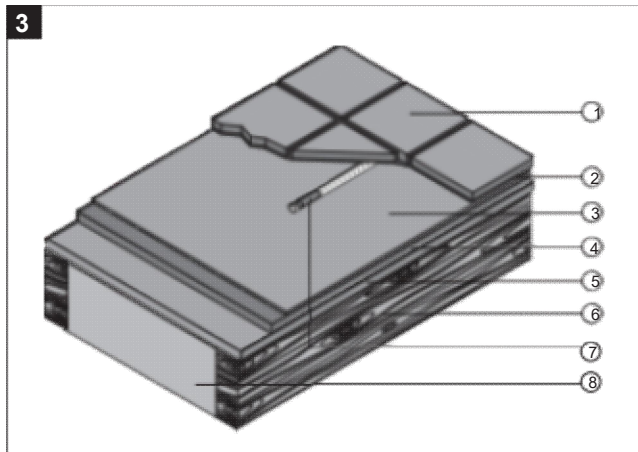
1 tile glue + floor covering (e.g. floor tiles)
